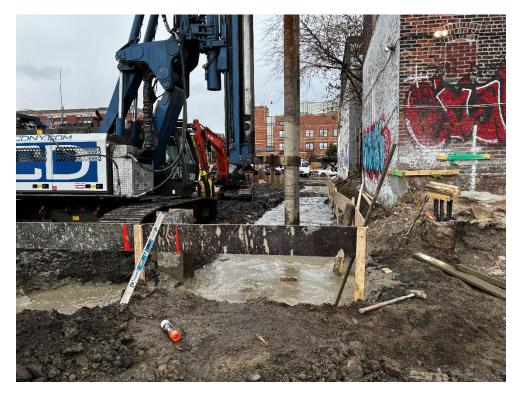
ECD advancing soil mix wall columns in the central part of the site (facing southeast.)
